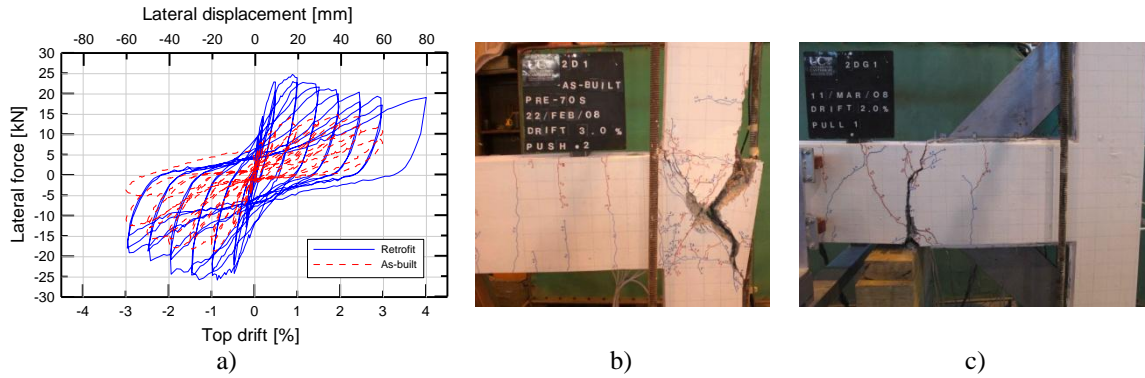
Feasibility study of joint retrofit with fully fastened haunch (Test 2DG1): a) Hysteretic behaviour; b) Joint shear hinge in the as-built specimen; c) Beam flexural hinge in the retrofitted specimen (Genesio and Akgüzel, 2009)
